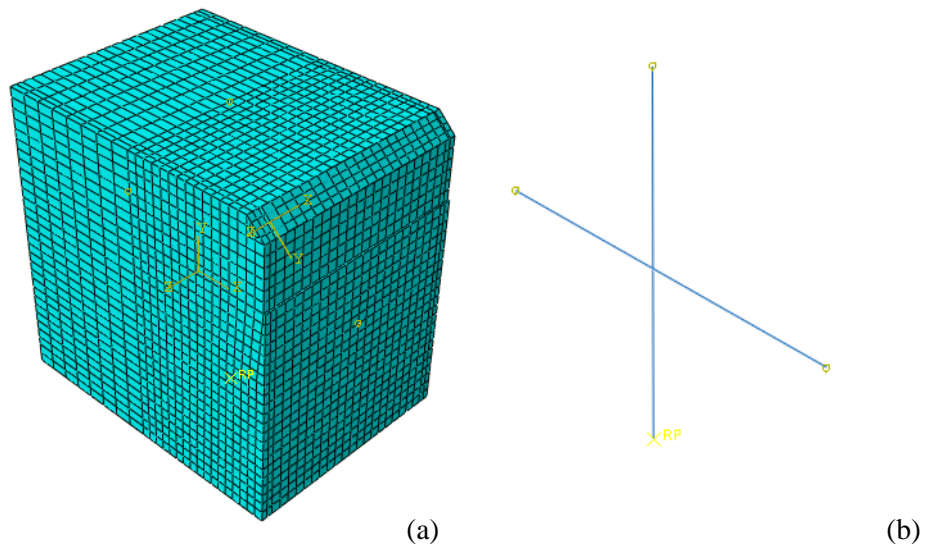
the model instances (a) Reinforced concrete, (b) Reinforcement bars
